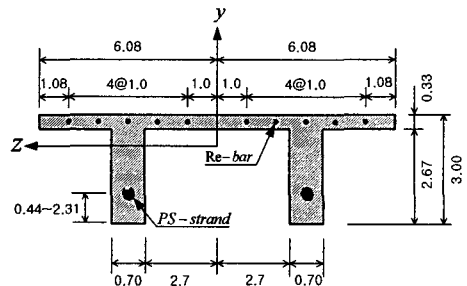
Cross sectional dimensions of double T-beam (unit : m)
